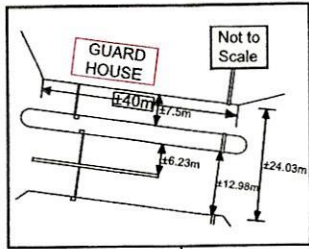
SUBDIVISION LAYOUT PLAN
